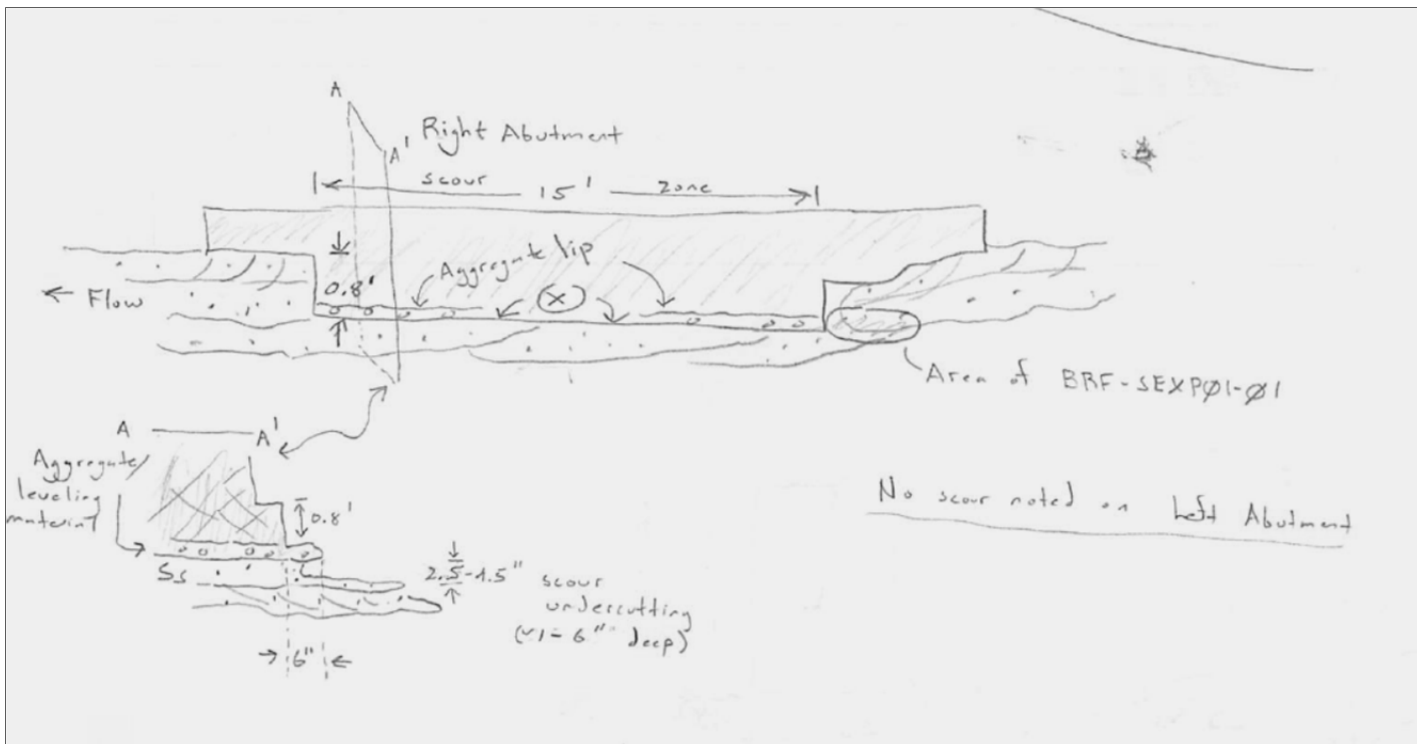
Field sketch of Bridge Fork Bridge, looking at right abutment head-on (top) and in cross-section (bottom left) .
